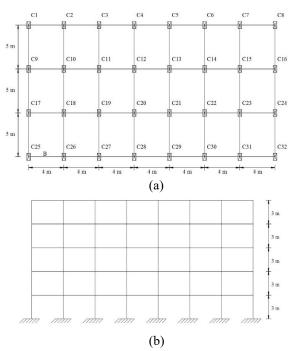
(a) Plan and (b) elevation of considered 5storey building
